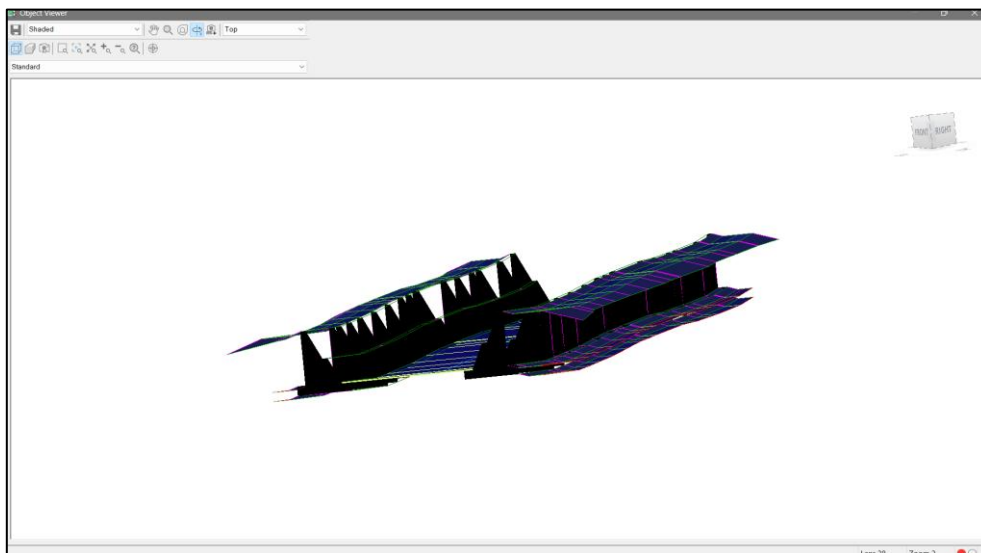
Corridor modelling results showing river cross-section alignment with retaining walls.
